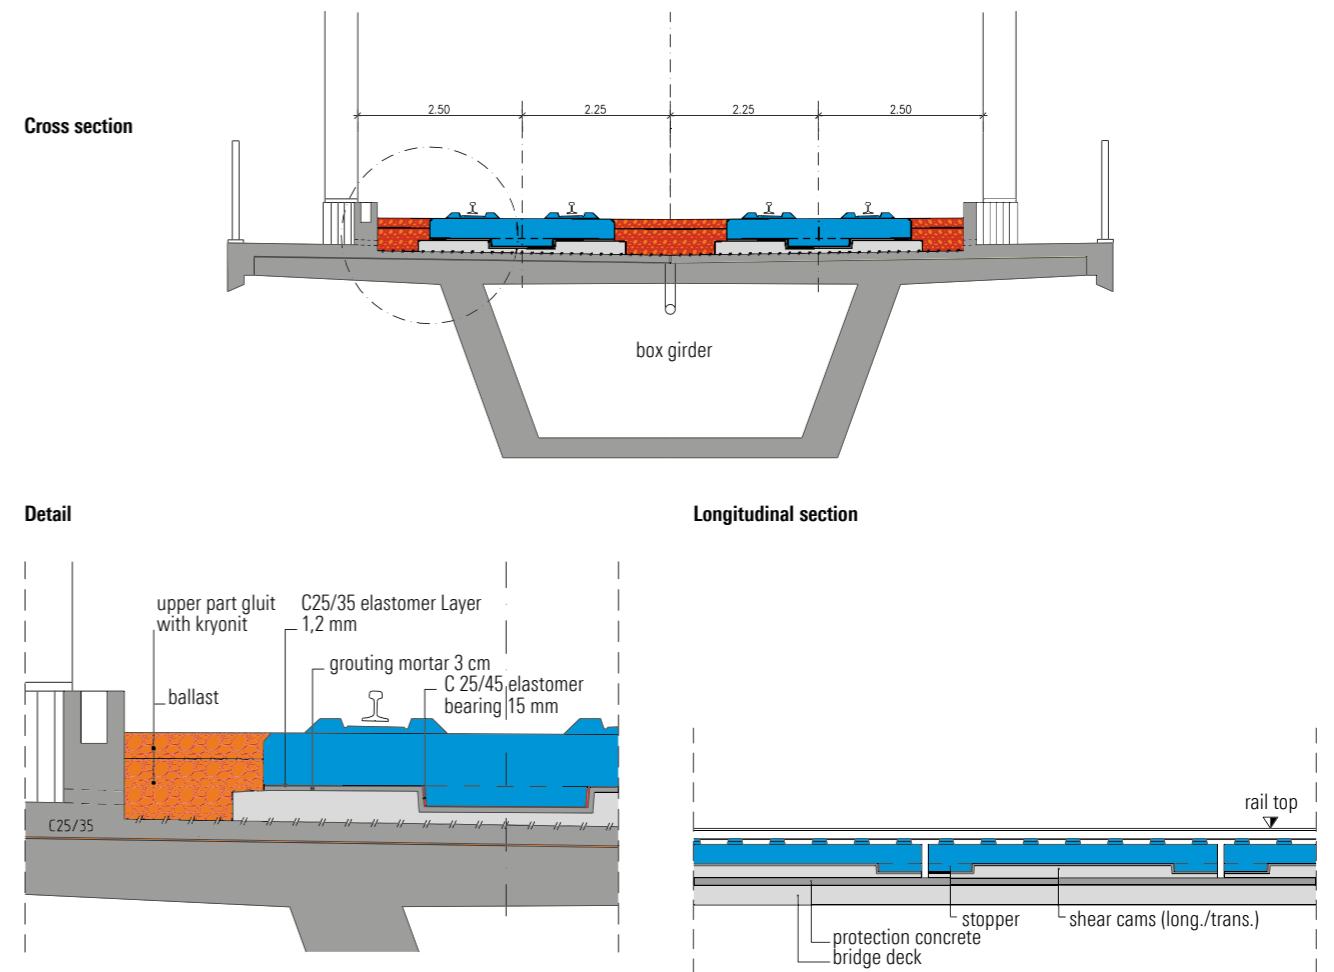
Typical layout of the slab track for a long bridge (>25 m)
